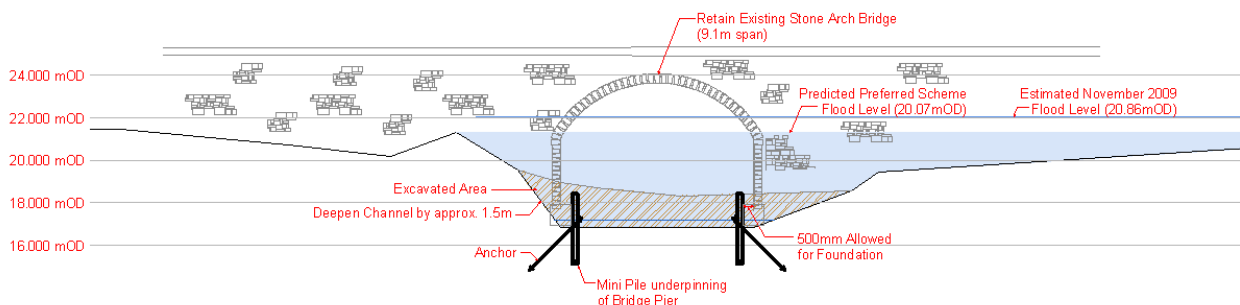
Proposed Works at the Railway Bridge in Craughwell
